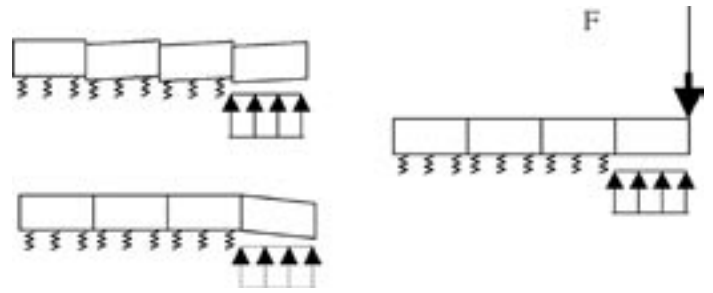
Warped position of newly placed tunnel rings (left) or downward force exerted by TBM on tunnel (right)
